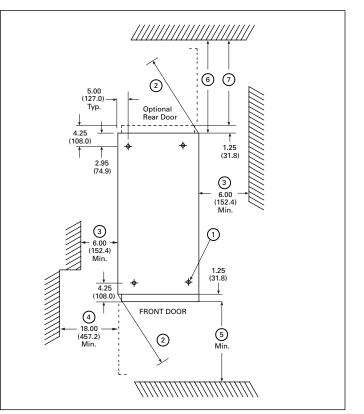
Typical Anchor Plan for MEB, Indoor or Outdoor
